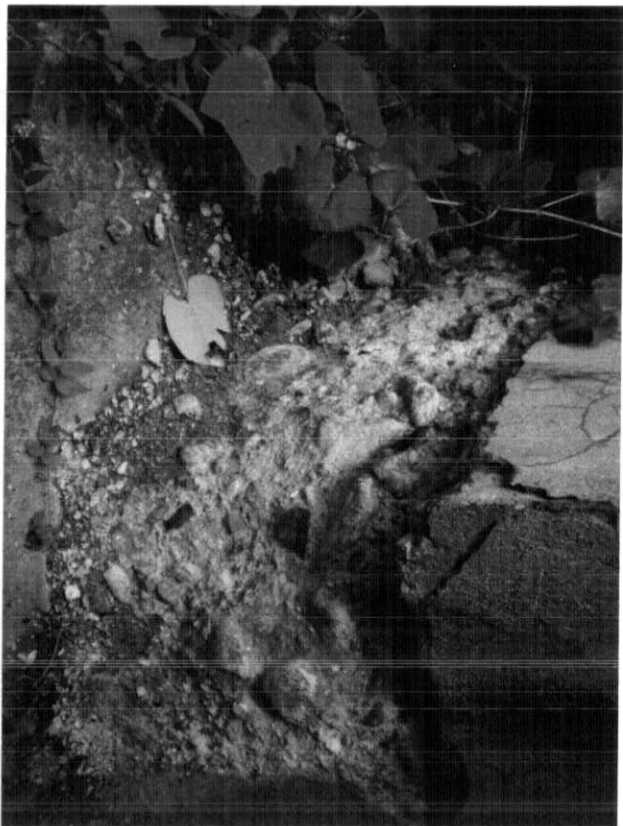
SOUTH END OF PIER CAP WITH A 3½ FT. X 15 IN. X 2 IN. D. SPALL.
